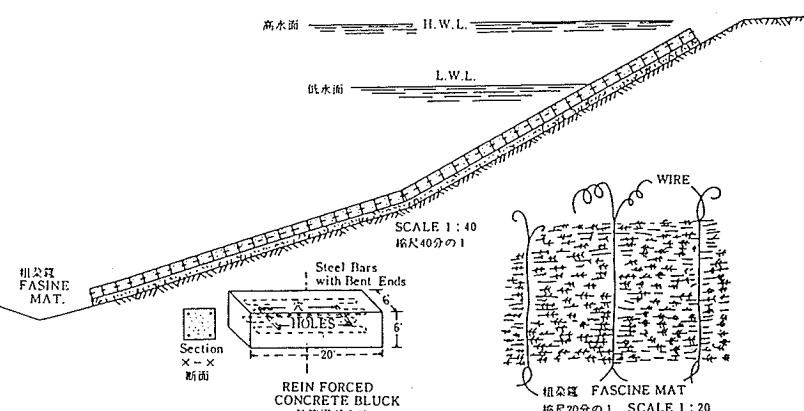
JAPANESE FLEXIBLE FERRO CONCRETE MATTRESS
